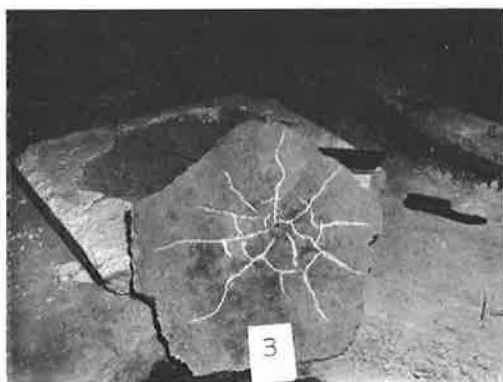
Bottom surface of typical cones punched out of pavement in static load tests.
